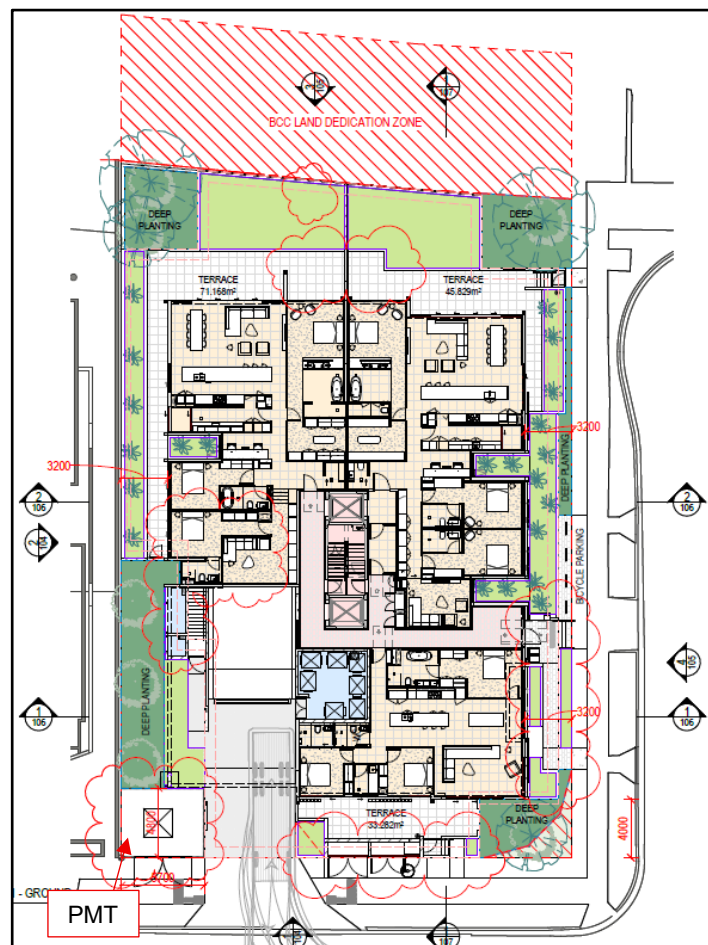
Proposed Ground Floor Plan (Source: MODE)
